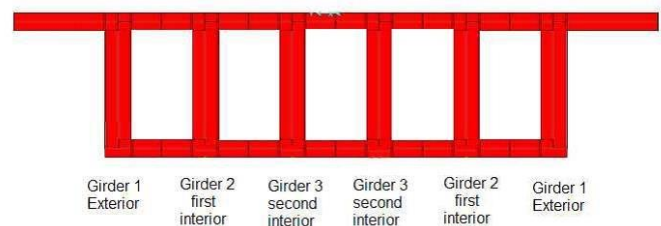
Cross section of the bridge consists of one lane (not to scale)
